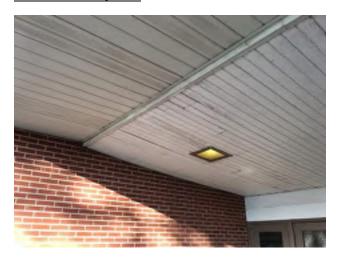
Main entrance. Painted wood soffit (right) and metal vented soffit (left). Soffit could be painted as part of entry vestibule install (Priority 0).
